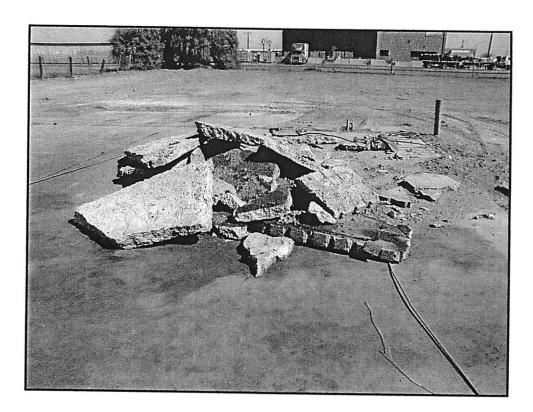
Broken concrete with some hydrocarbon staining piled on the shop slab.
